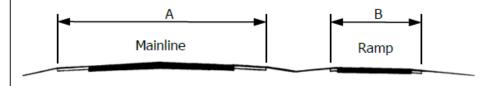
Approach roadway cross-section view for a mainline and a ramp that are carried across one bridge.
